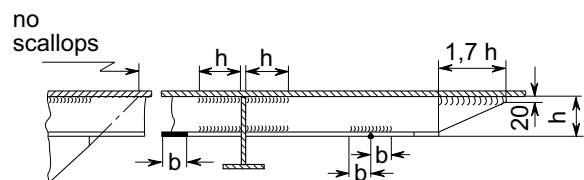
Welds at the ends of girders and stiffeners
